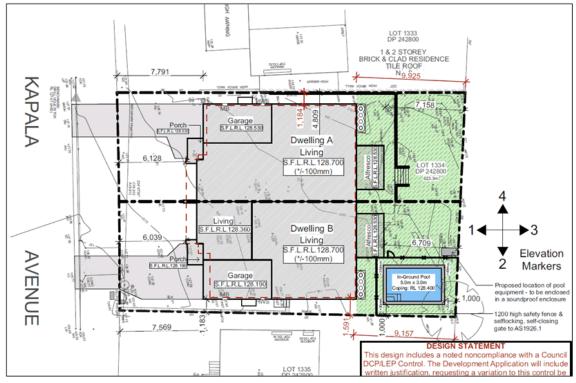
Proposed Site Plan (Source: JR Design & Drafting, 2024)
